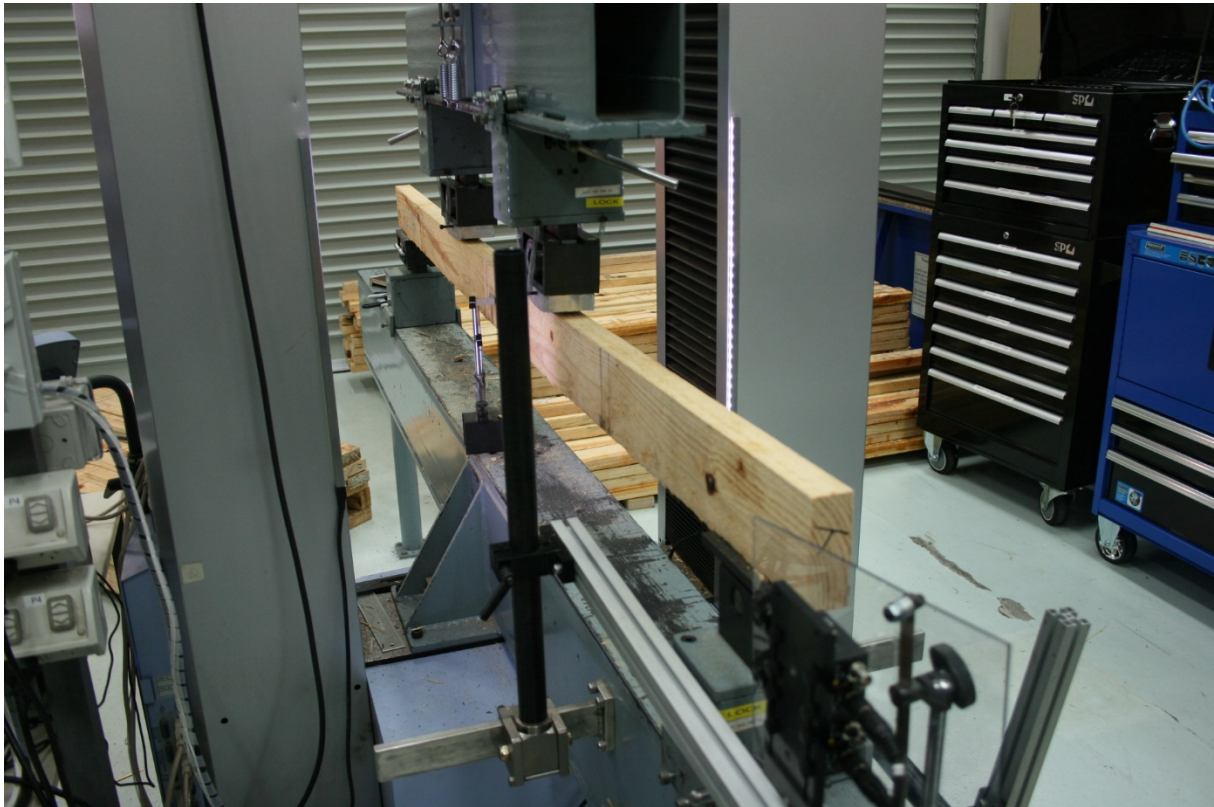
Shimadzu Autograph AG-X 100 kN (10 tonne) universal testing machine.
